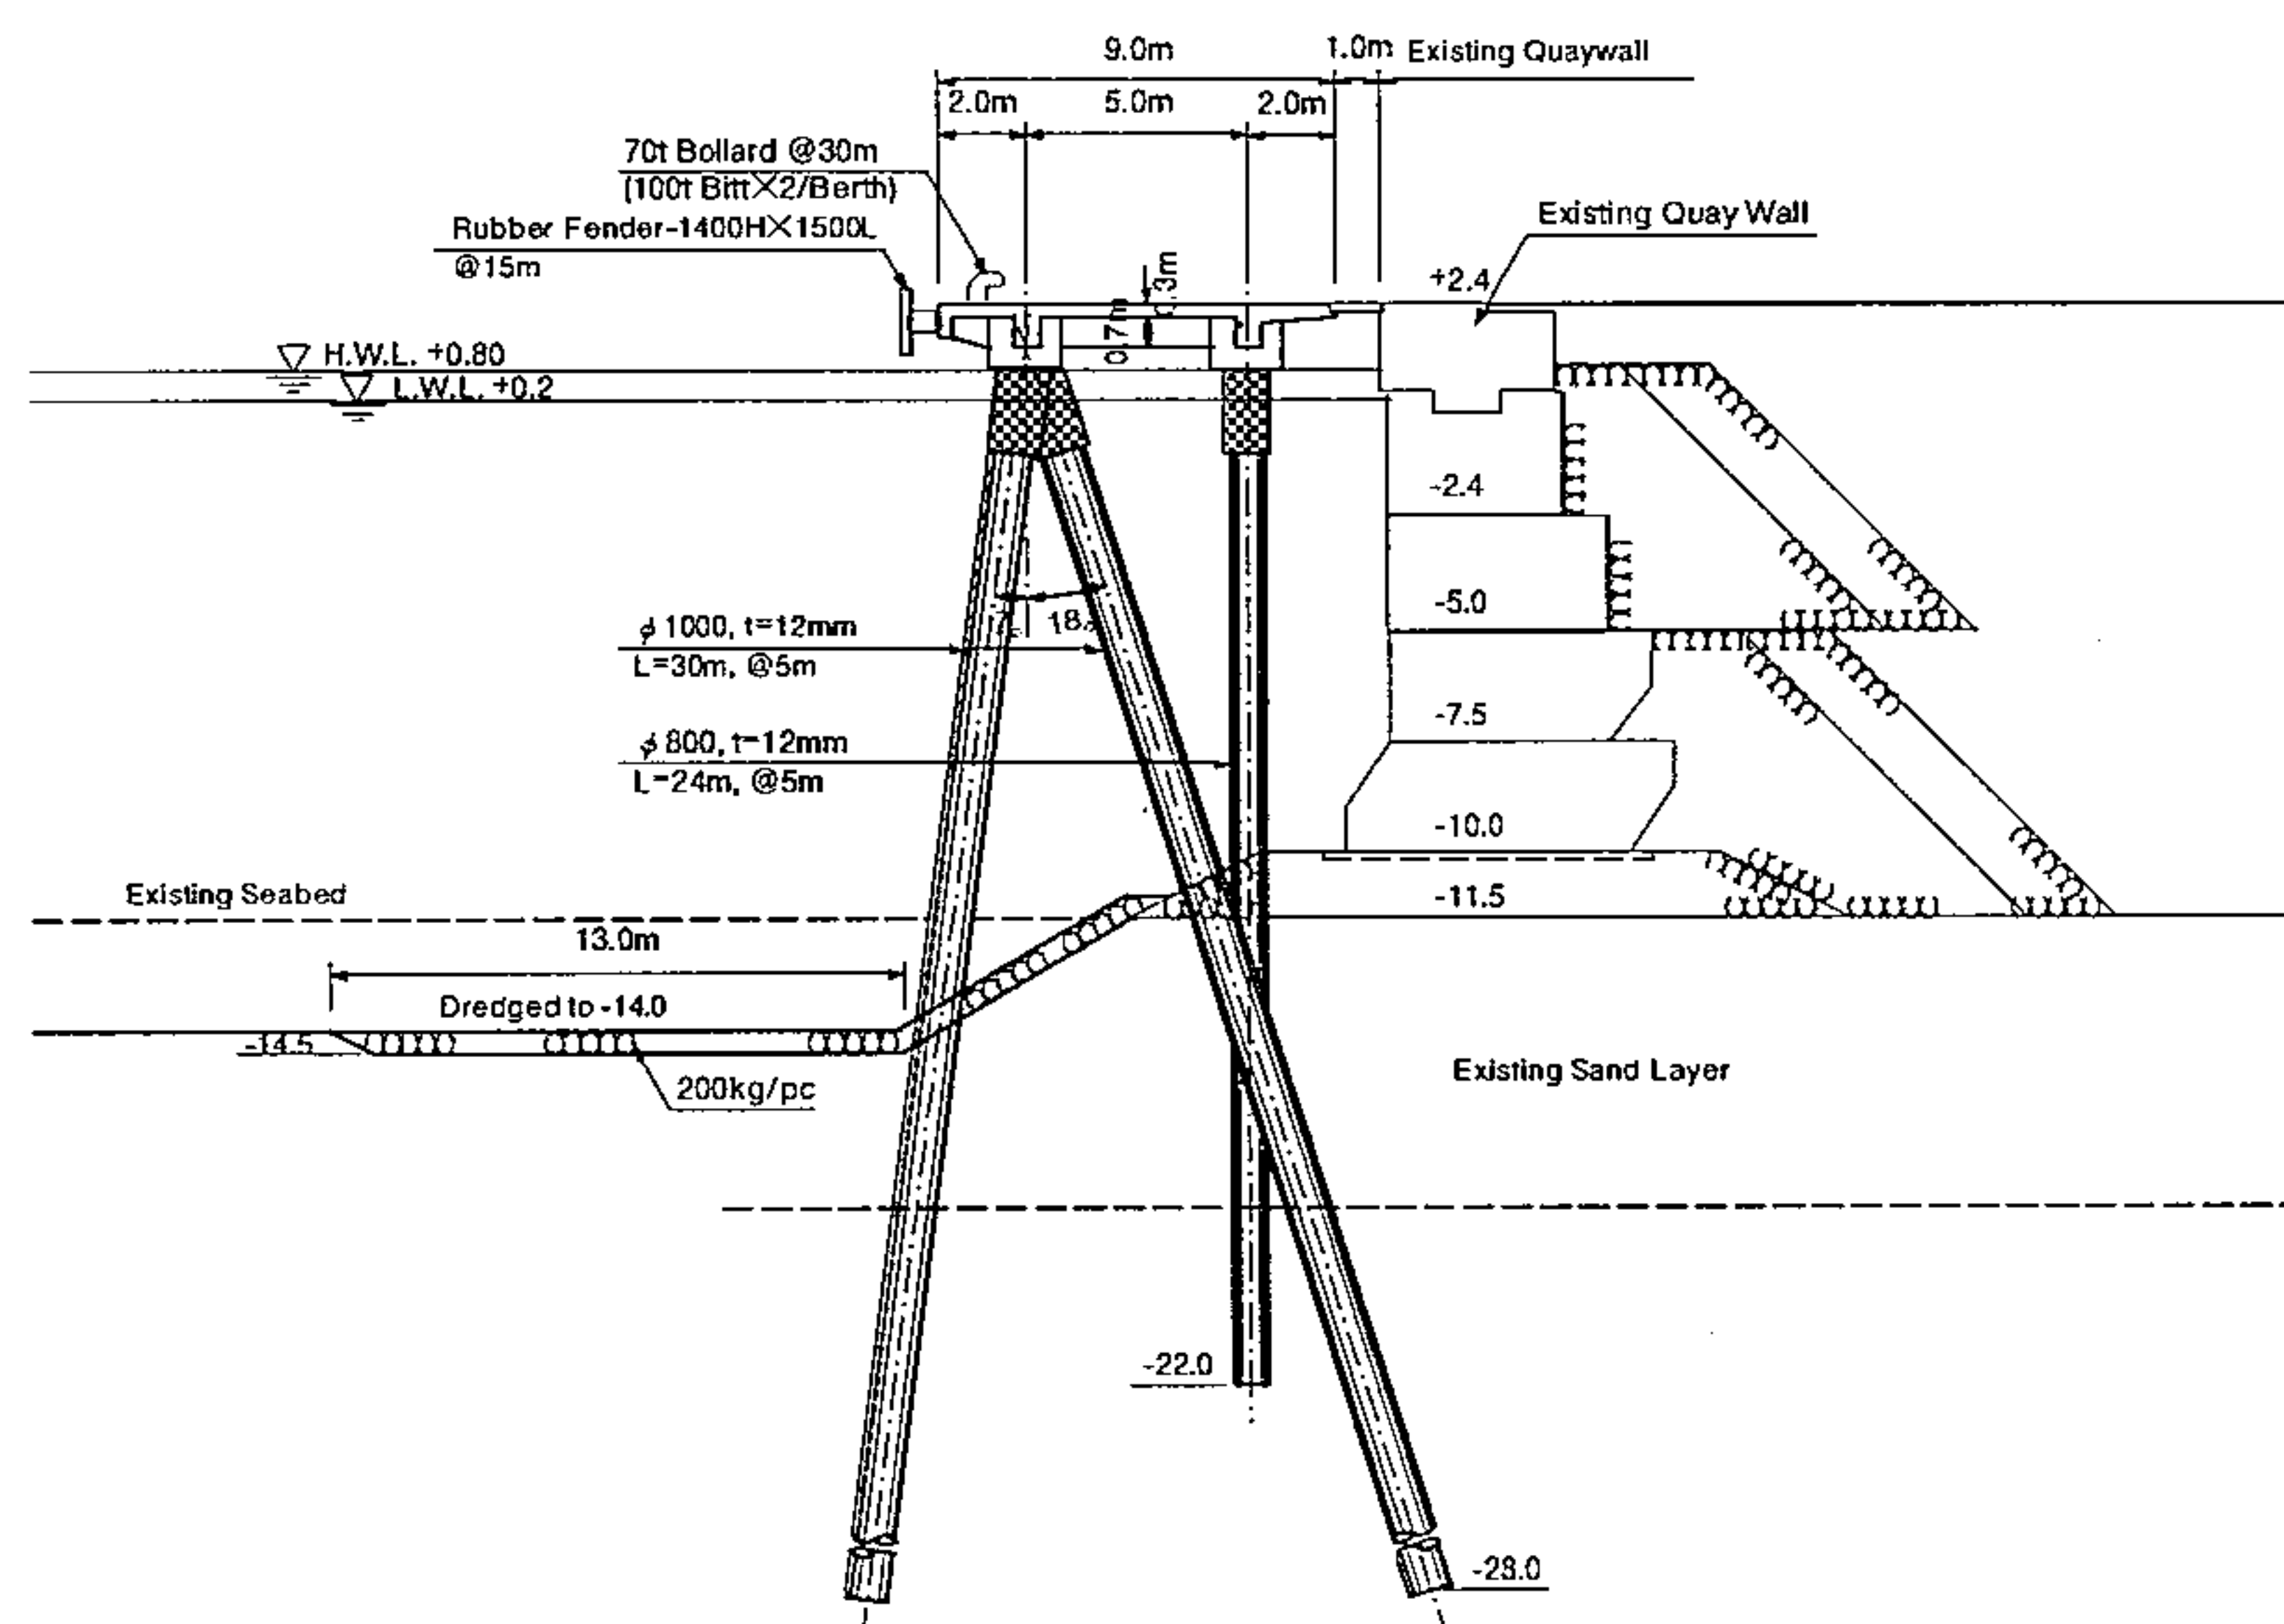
Alternative Type of Quay Wall for New Grain Berth
